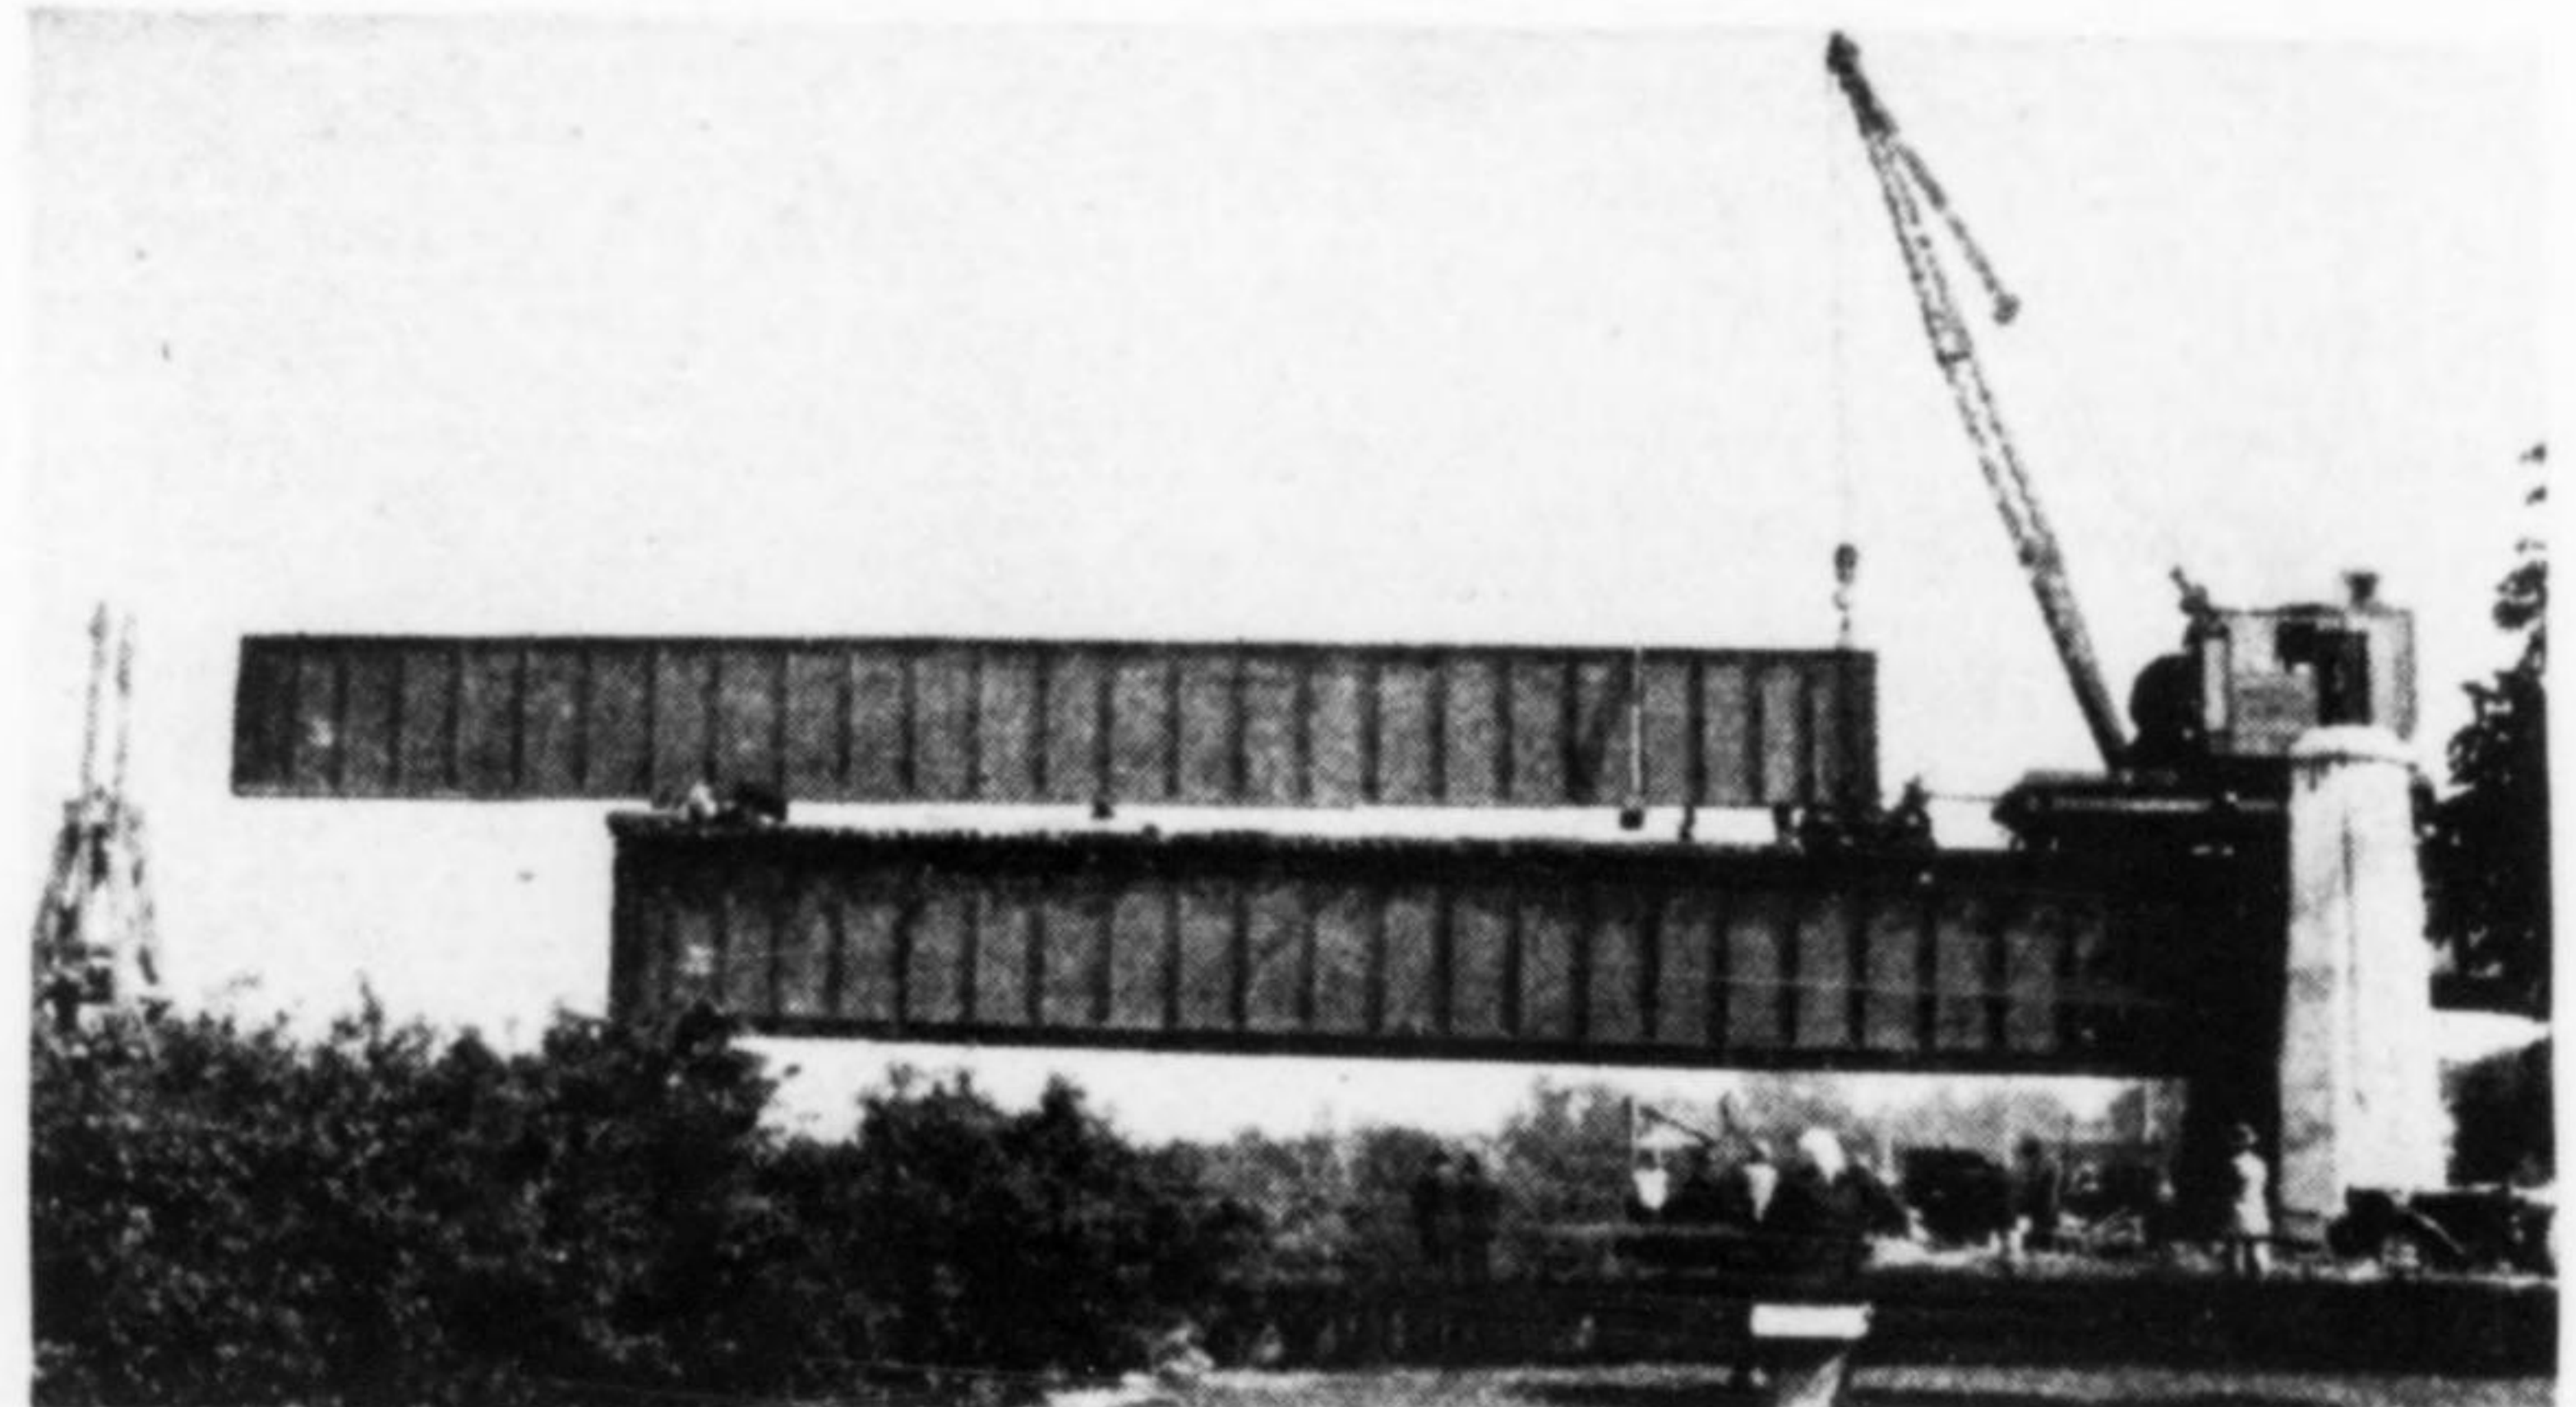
ERECTING A GIRDER, ST. JOSEPH RIVER BRIDGE
